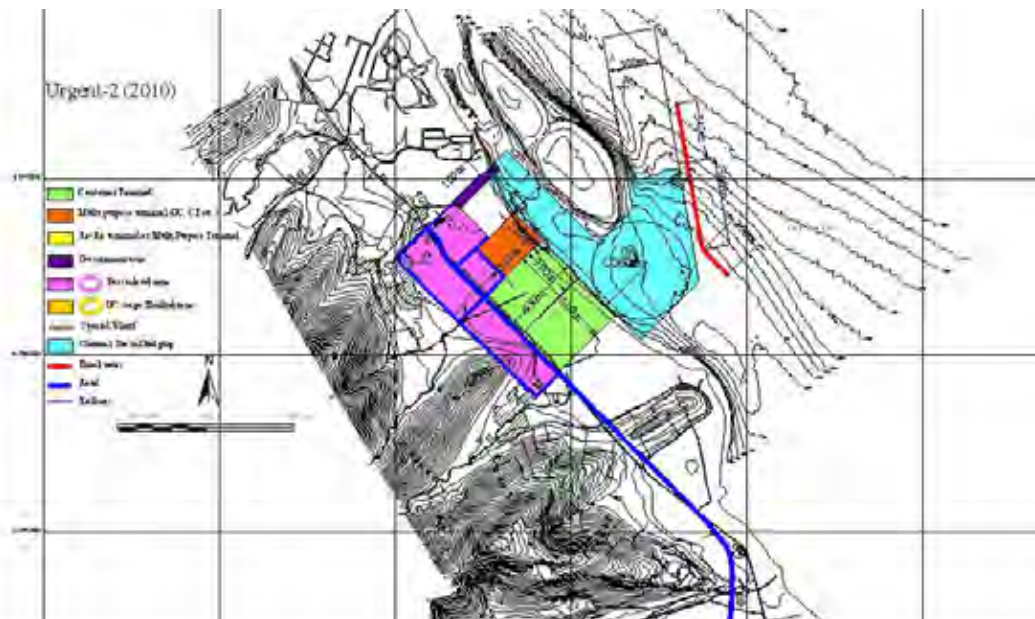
Urgent Plan of Bojonegara Port toward 2010
